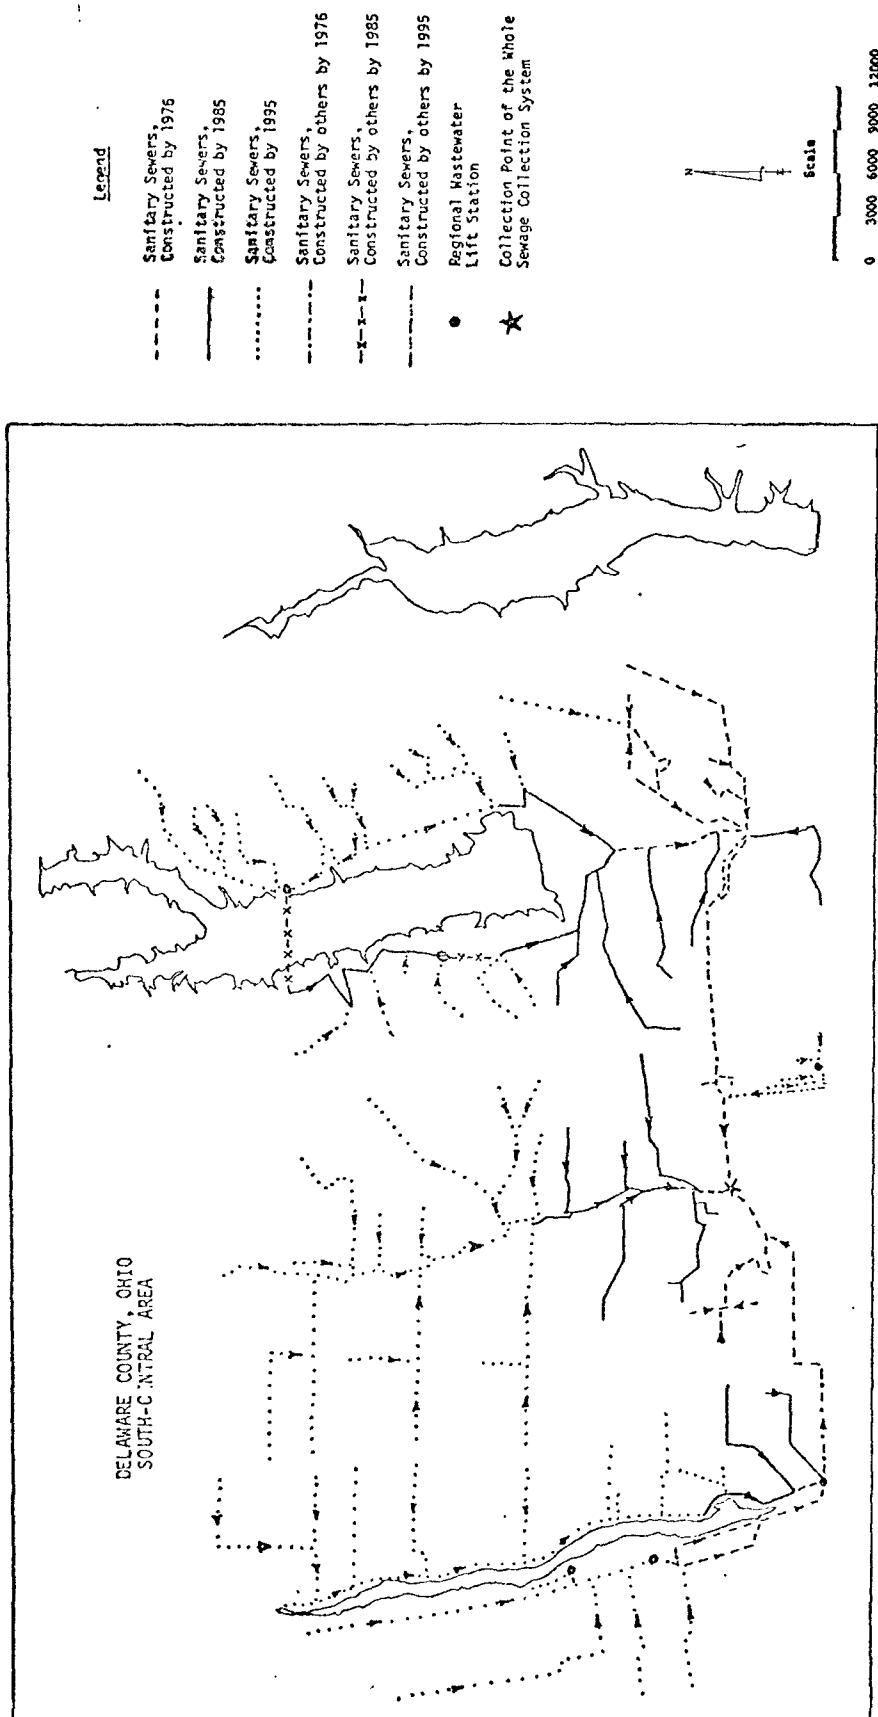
Basic Plan for Sanitary Sewerage Facilities
